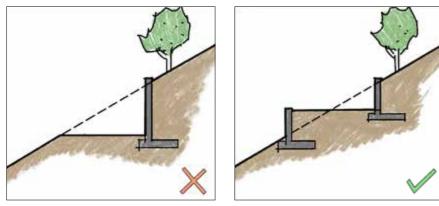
Where retaining structures are needed, avoid or minimise the need for overbearing retaining walls with more modest and ¬¬ regular retaining walls
